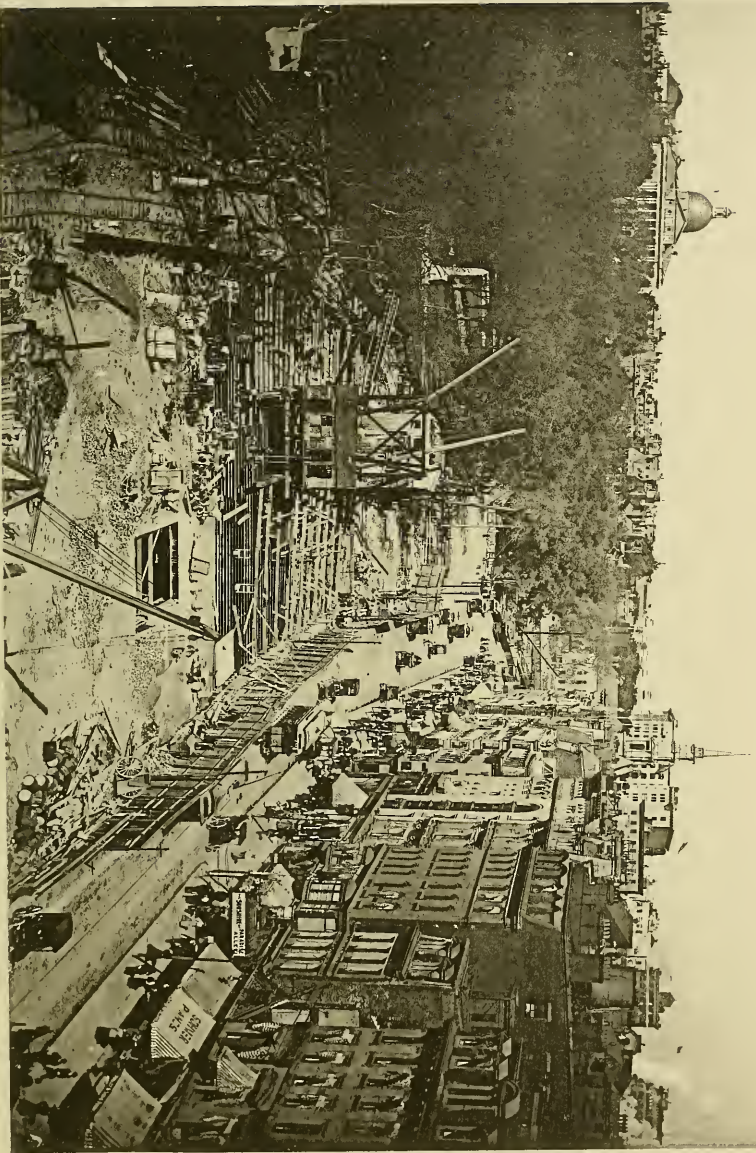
SECTION 2, BOSTON COMMON, TREMONT-STREET MALL. WORK NEAR MASON STREET.
